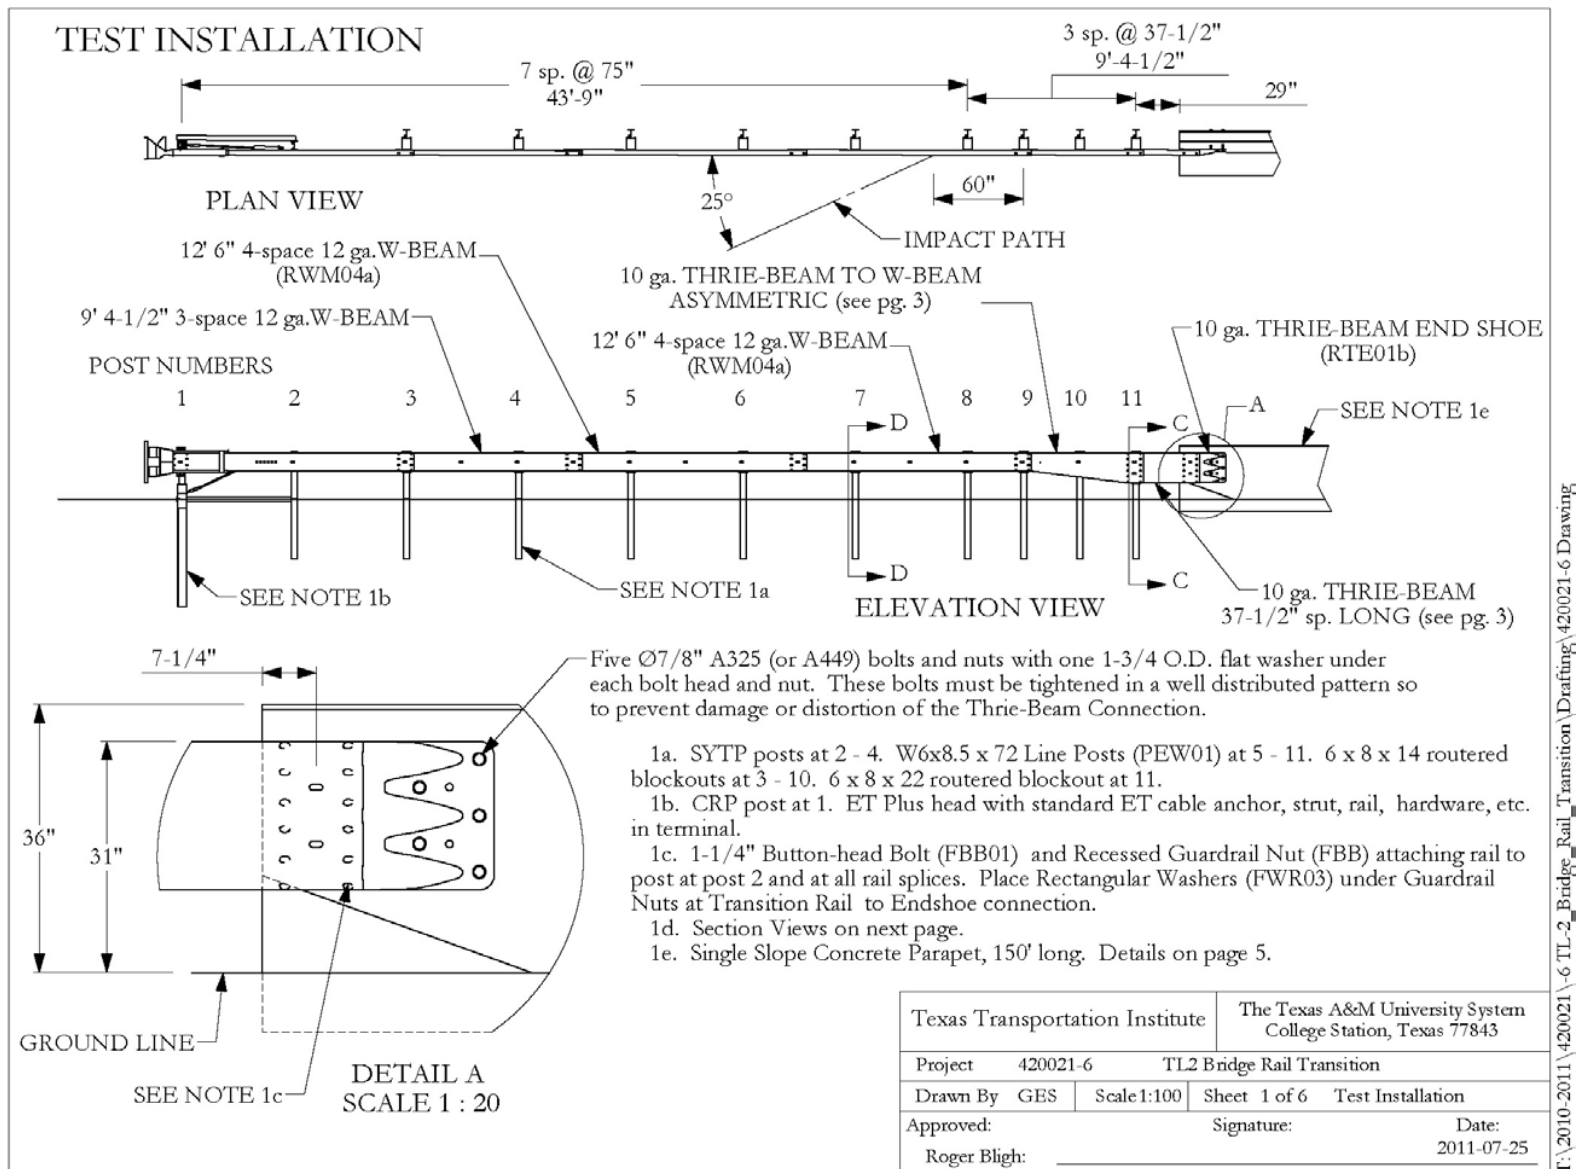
MASH TL-2 Thrie Beam Approach Guardrail Transition
